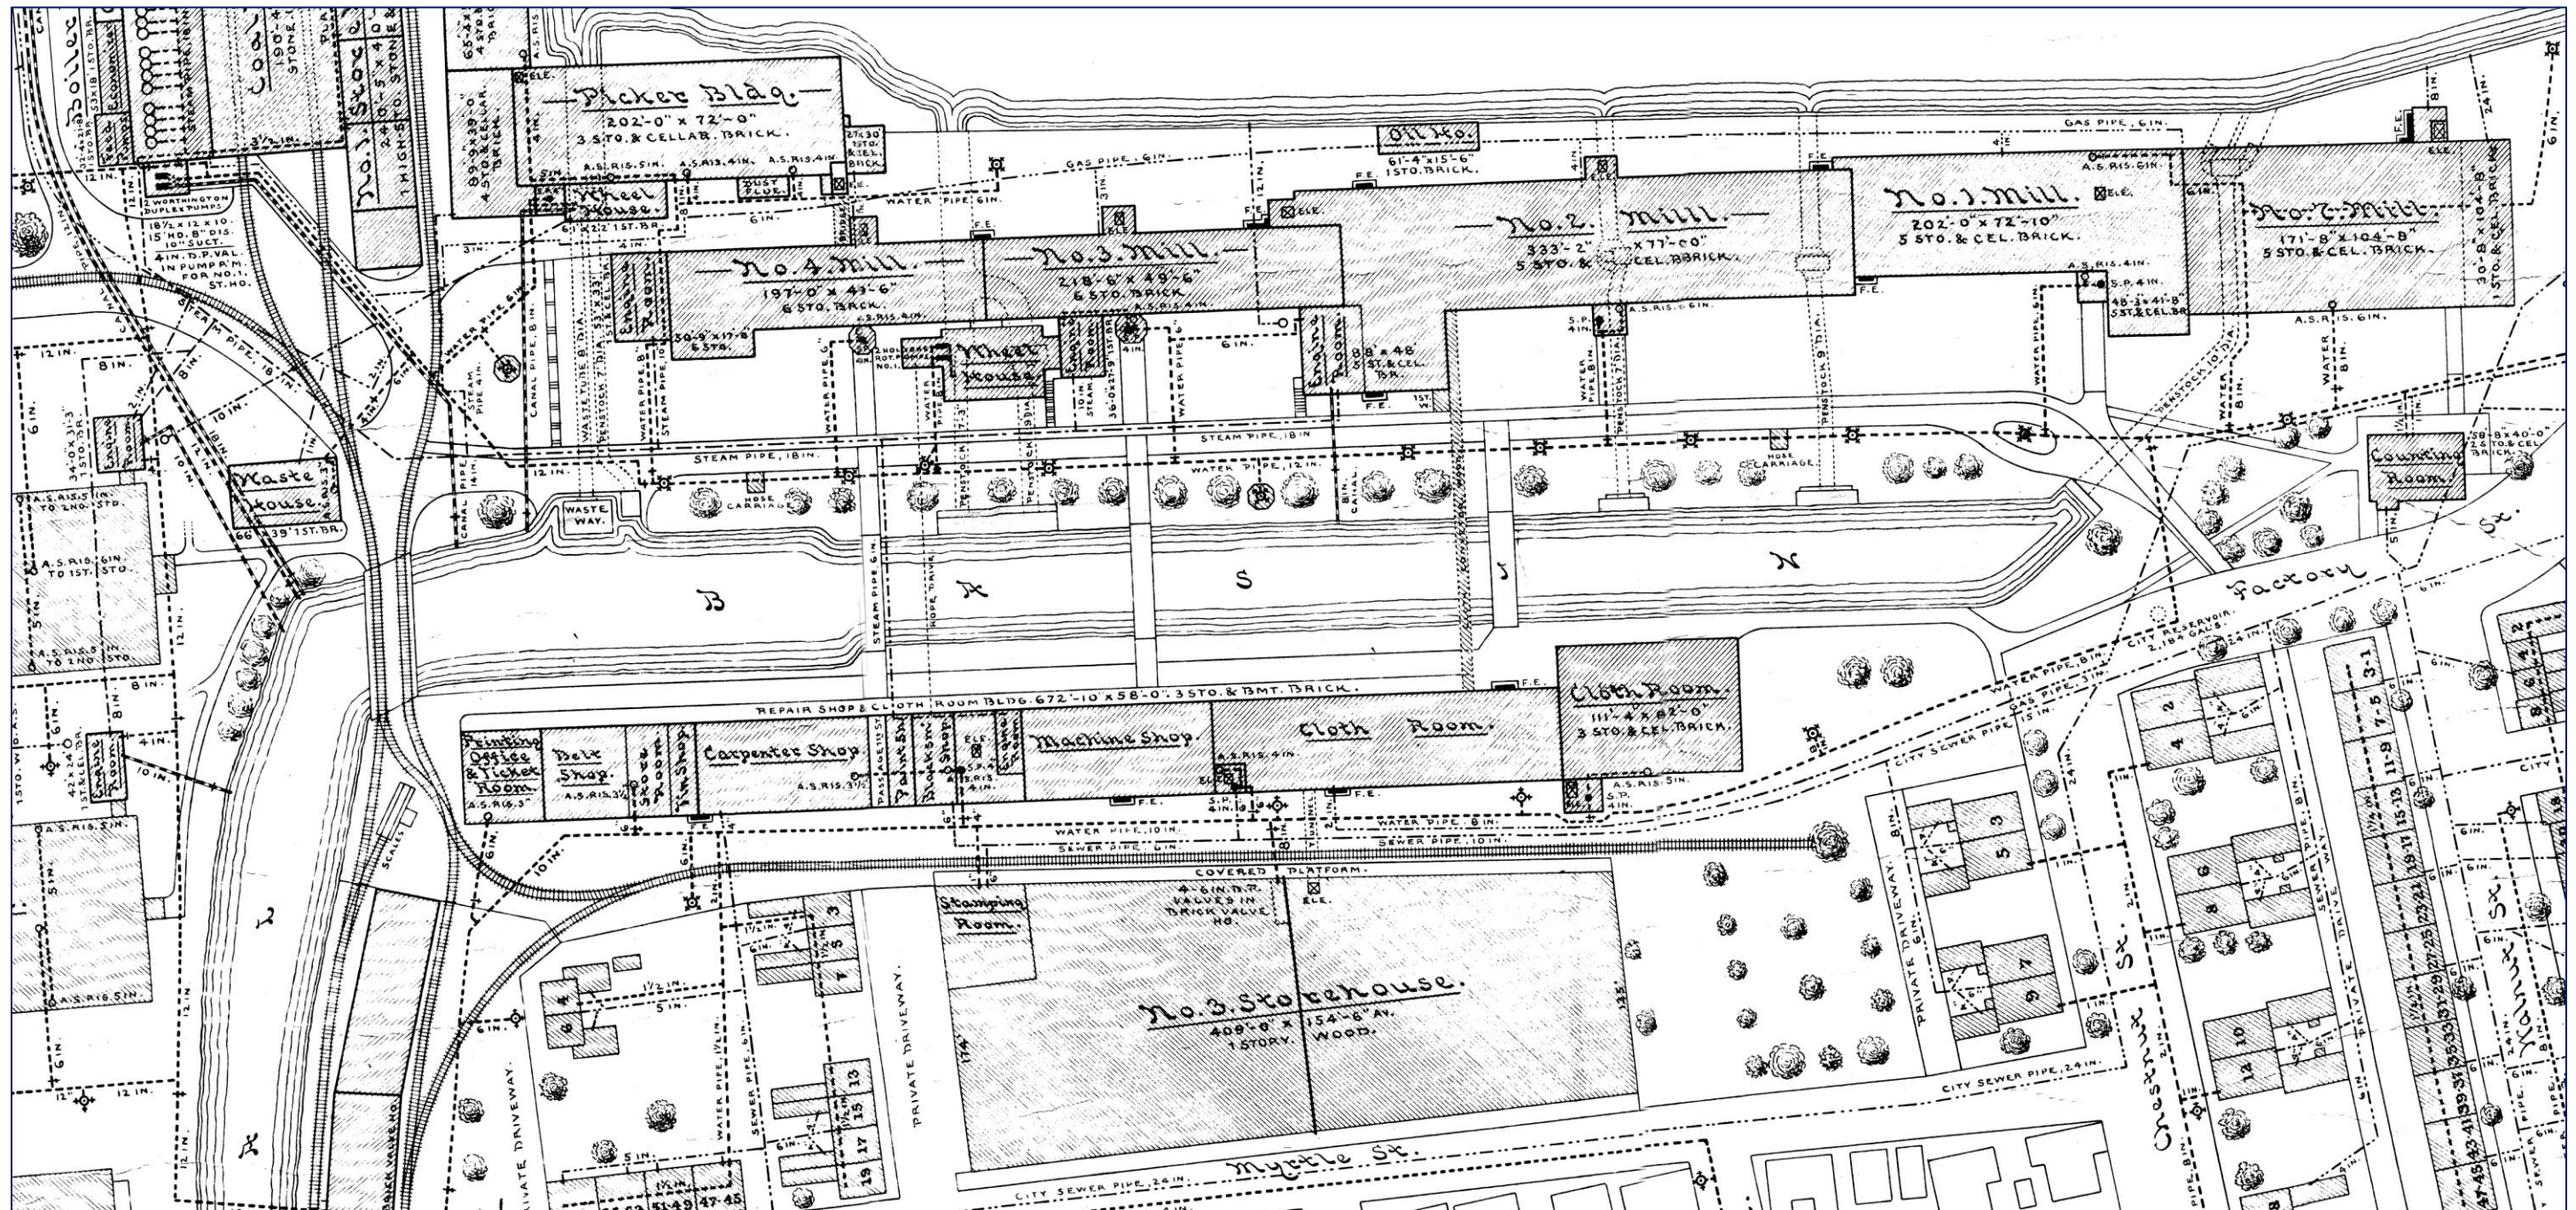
Plan of Nashua Manufacturing Co. in 1907 showing Canal Basin (removed 1972) and arrangement of bridges, penstocks and other features related to it. (Source: C.W. Collins).
